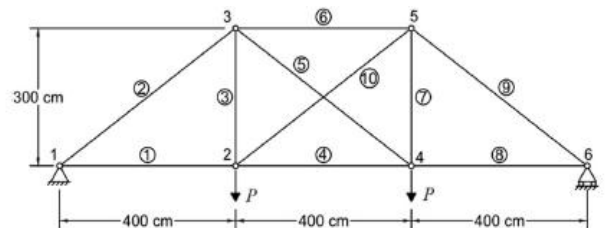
Structural scheme of the flat truss (Li e Zhang [14])
